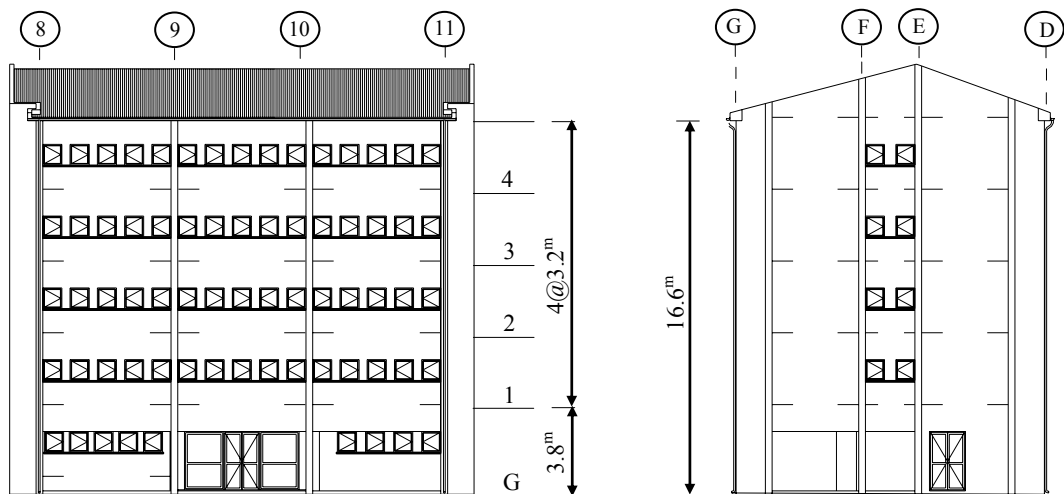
Front and lateral elevation views of the MPWR building (adapted from Çağnan, 2001)
